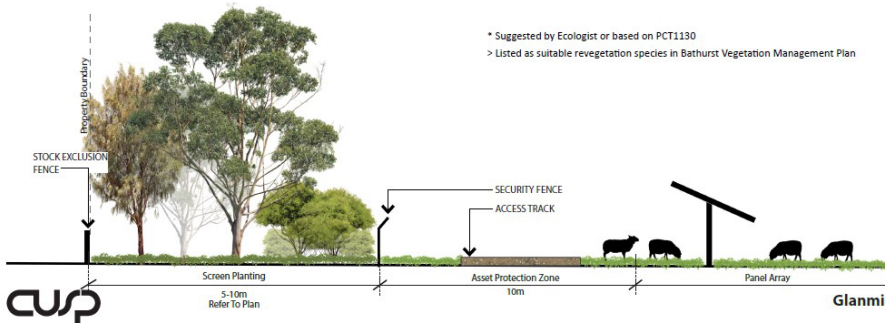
Extracts from the Landscape Concept Plan, showing the layout of proposed planting areas
